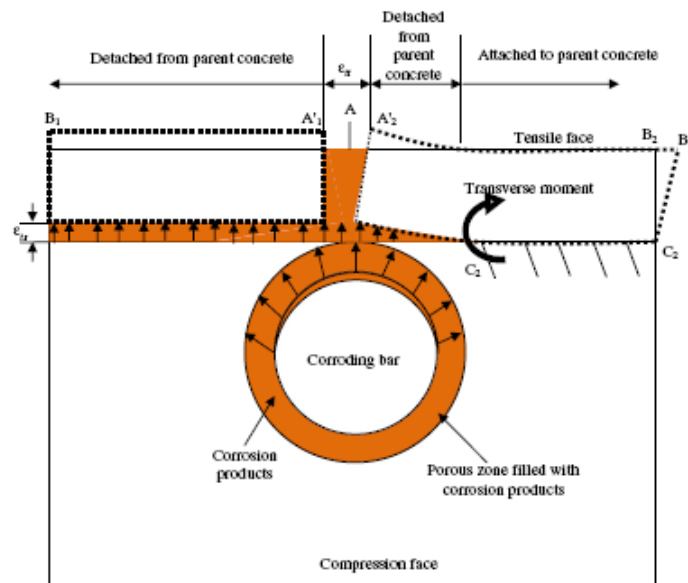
Cross-section of a corroding beam with crack pattern B.
